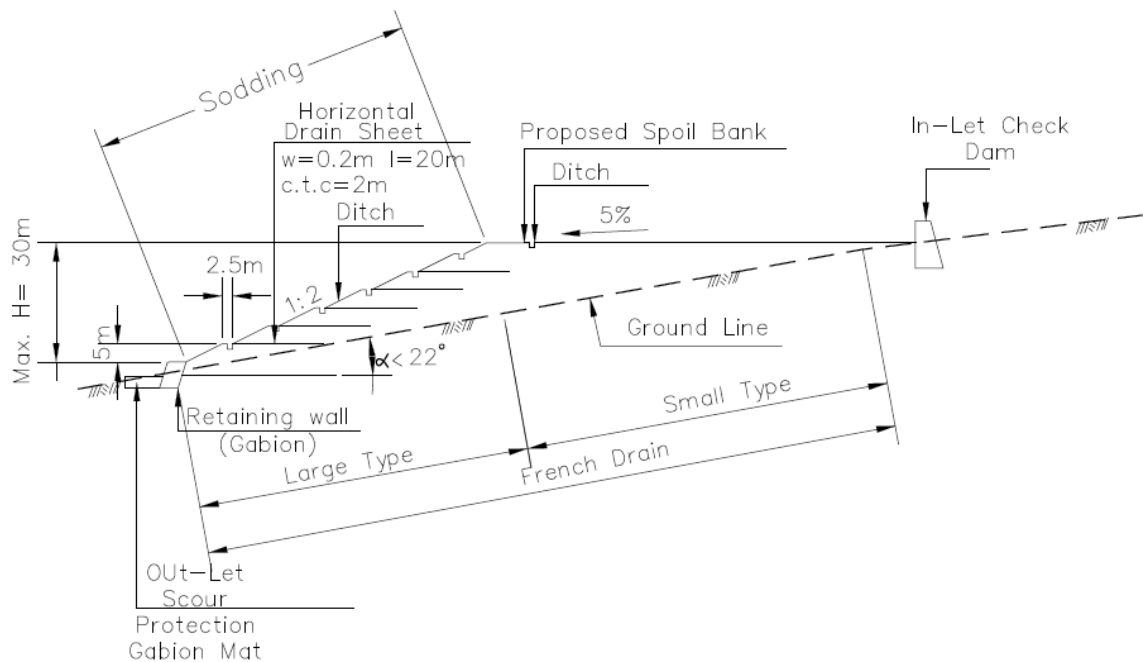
(a): Typical Arrangement for Spoil Banks: Plan
